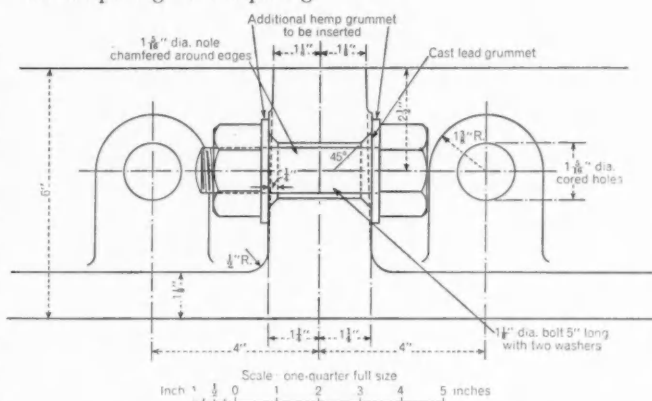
Detail of Circumferential Joint for Cast-Steel Segments
